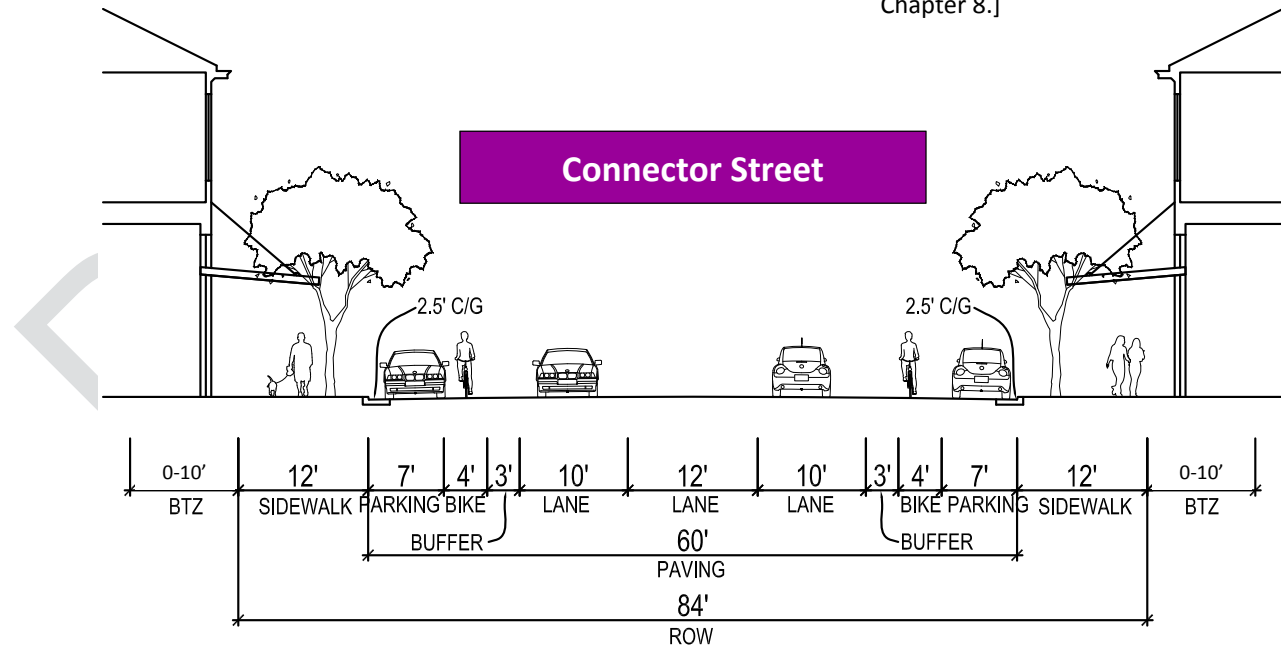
Street Type 2: Connector Street Cross Section
